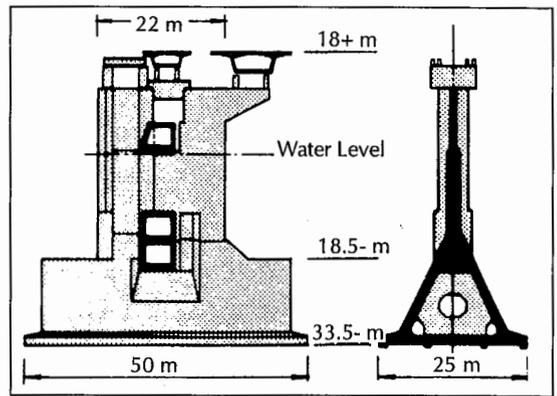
Construction of the pier foundations for the Eastern Scheldt barrier.
